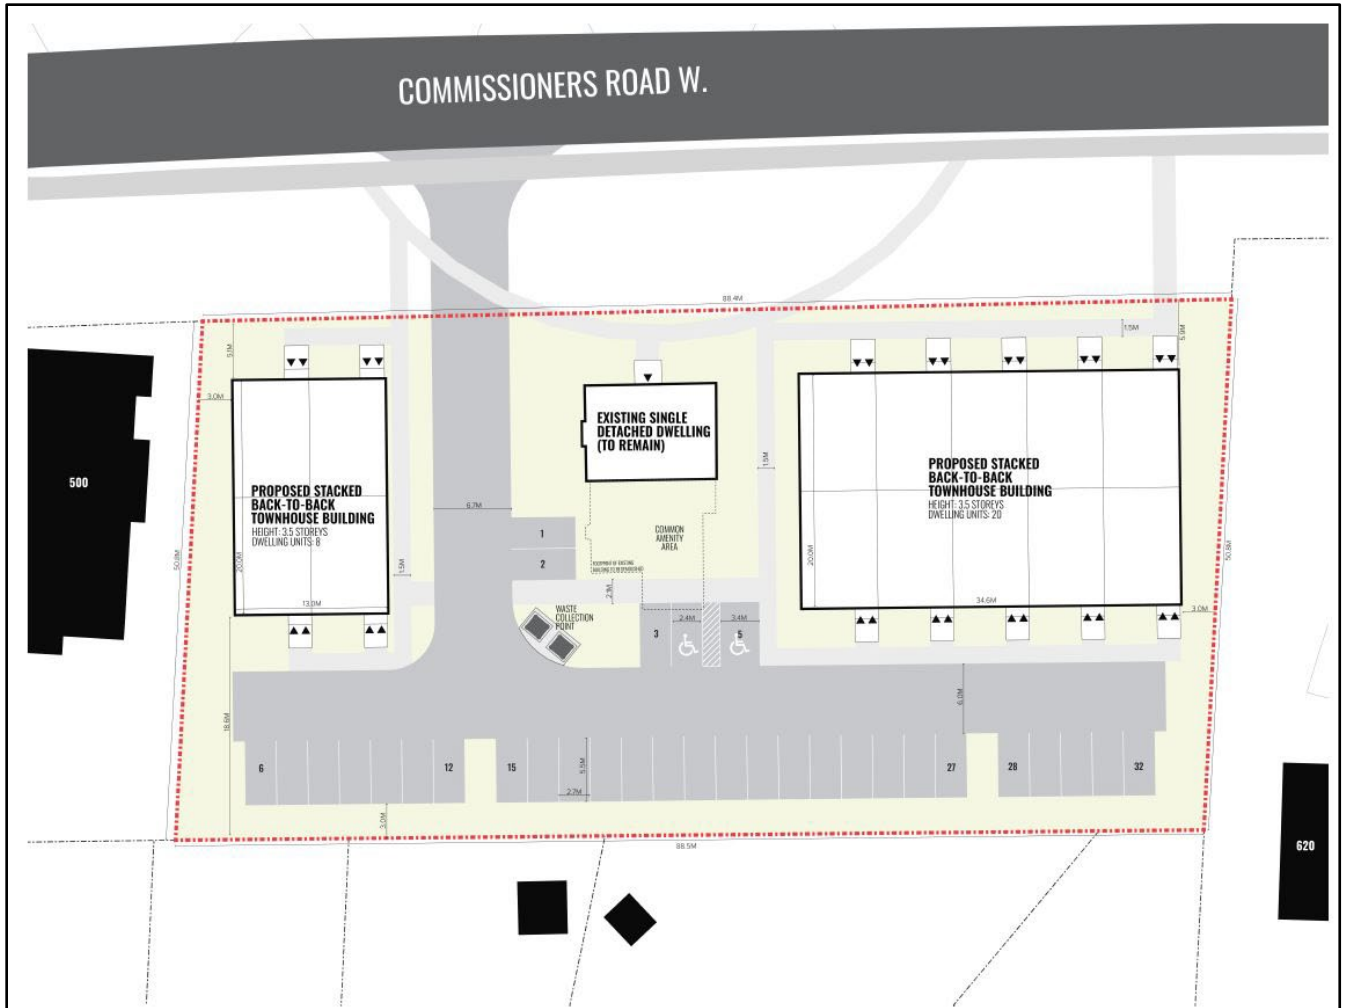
Conceptual Site Plan (Received January 2, 2024)
